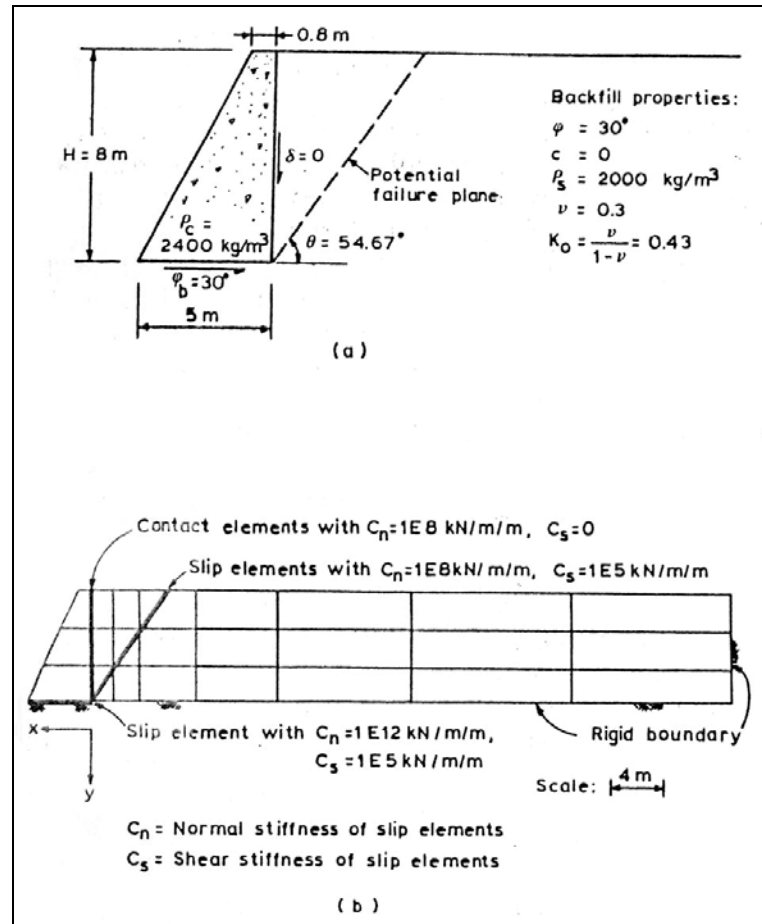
Gravity wall considered and its finite element idealisation (Nadim and Whitman, 1983)
